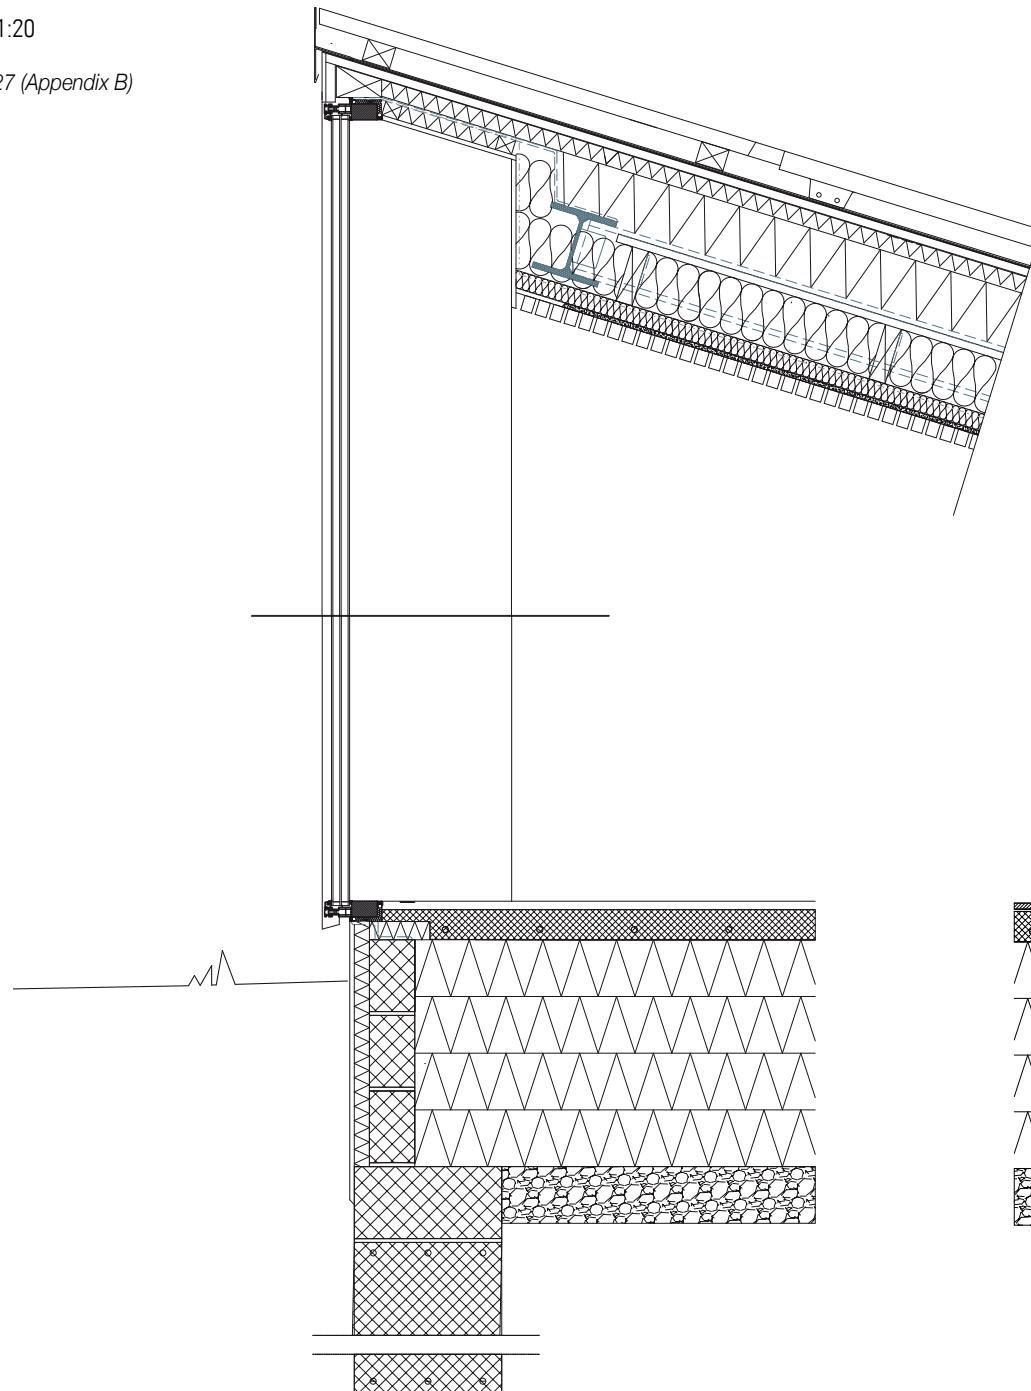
Technical drawing of roof, base, and window head and sill 1:20
